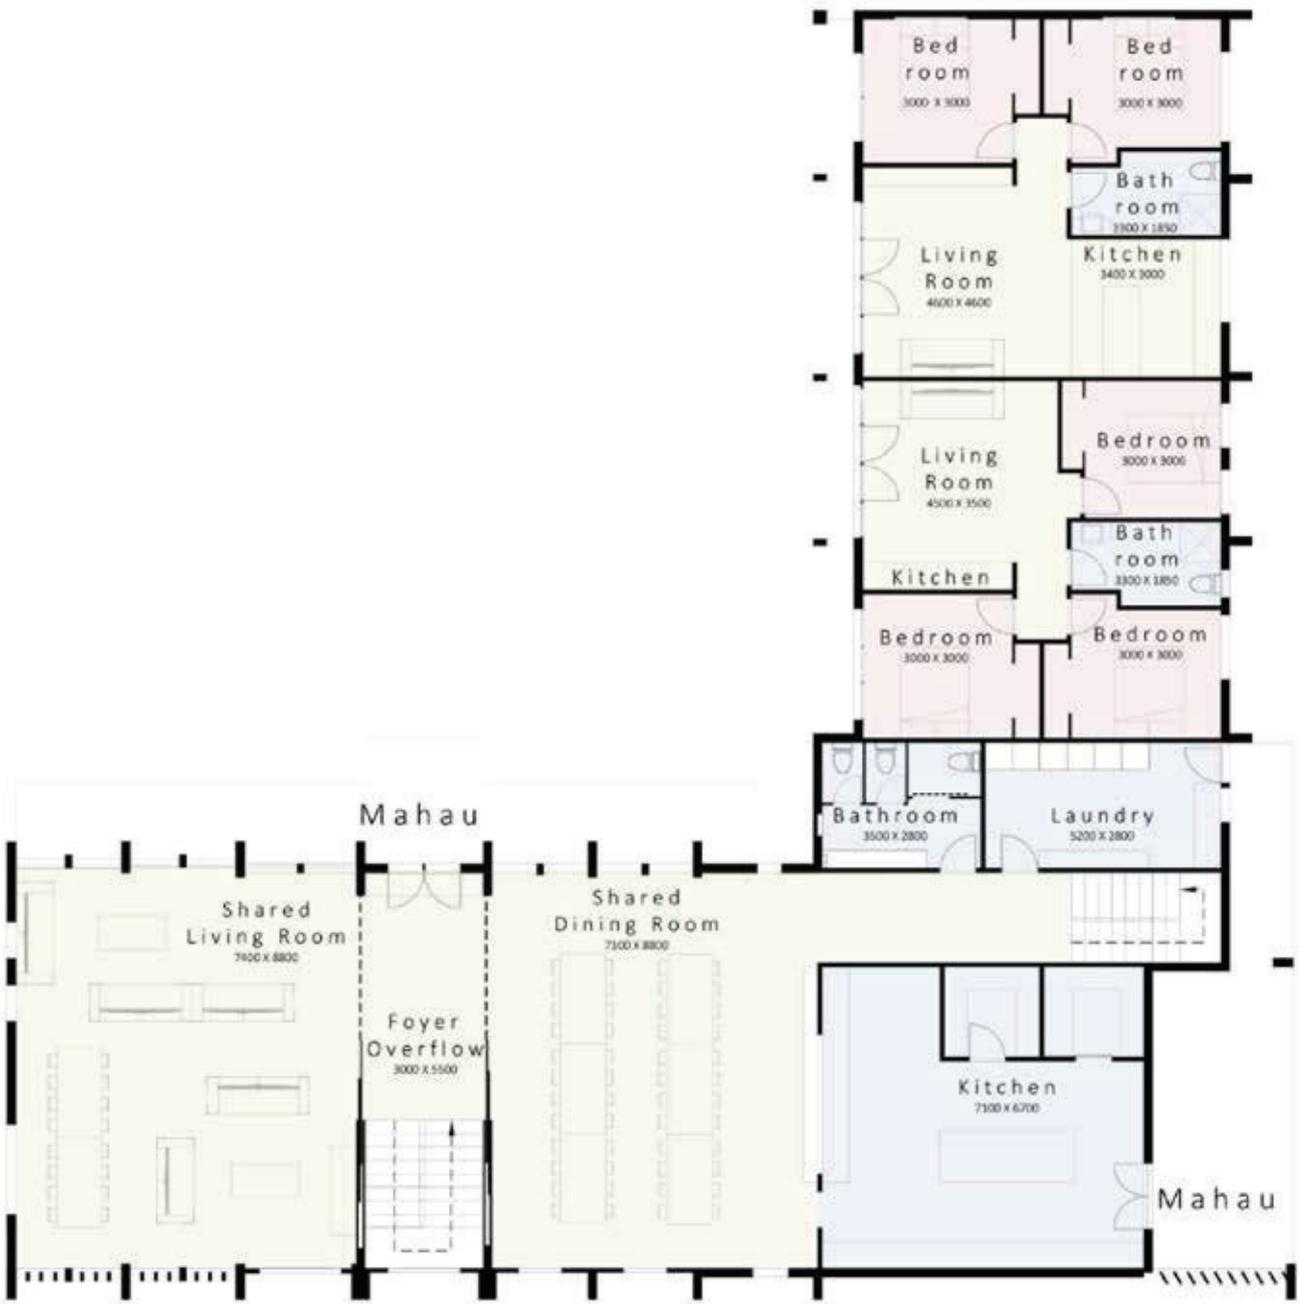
Whare Āhuru Ground Floor Plan, L-shape
